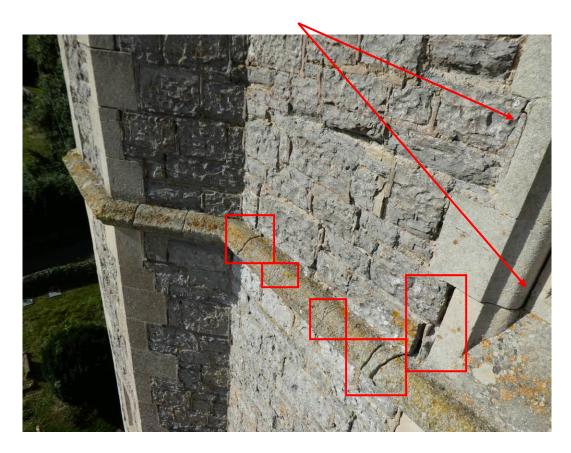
P1000319 Masonry Fractures & Open Joints Below & Around Belfry Window East Elevation
